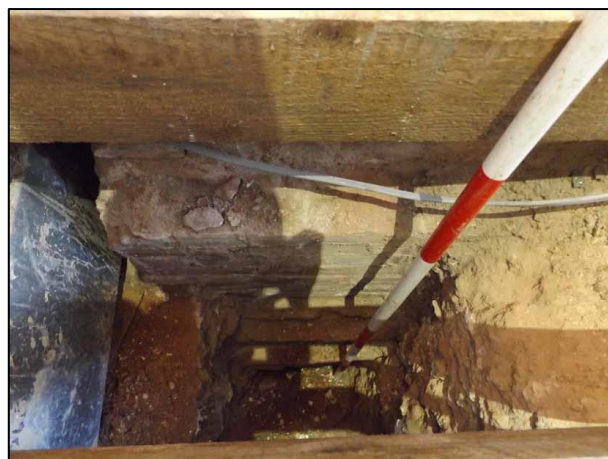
Test Pit 3, Town Hall brick foundations [301], looking NE (2m scale)
